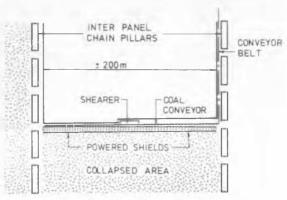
PLAN VIEW OF RIB PILLAR EXTRACTION
